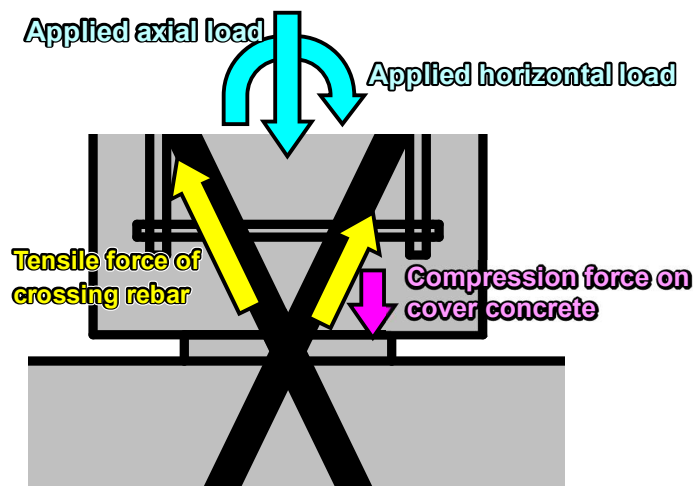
Cross-sectional equilibrium of Mesnager hinge
